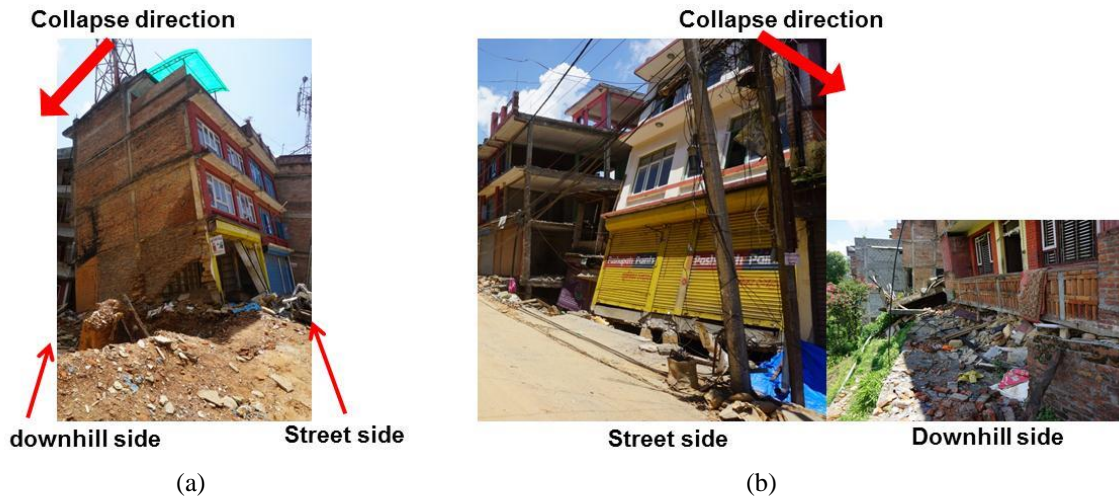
Building collapse to the downhill direction (in Chautara): (a) collapse with the failure of foundation; (b) failure of the ground column on the downhill site.
